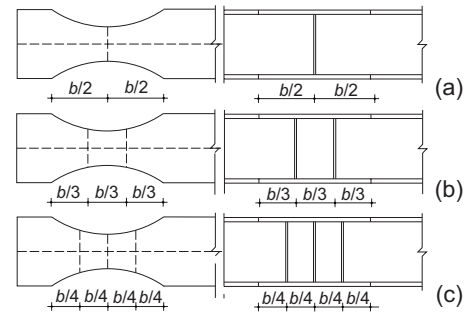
Placement of stiffeners in RBS beams with (a) one stiffener (STF-1); (b) two stiffeners (STF-2); and (c) three stiffeners (STF-3)
